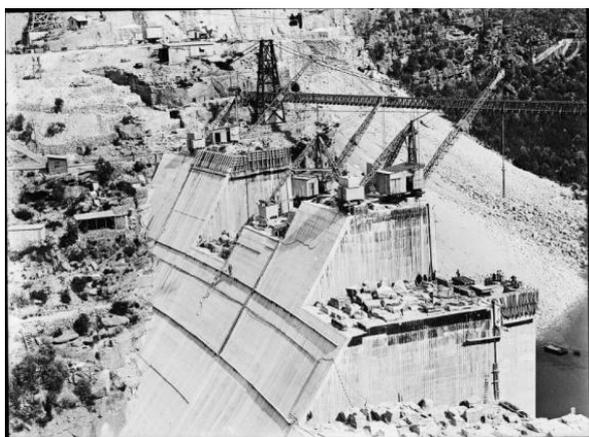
Photograph showing the ongoing construction of the Nepean Dam wall, 27 March 1931. *Source:* National Library of Australia, Fairfax Archives of glass plate negatives, PIC/15611/10047.
